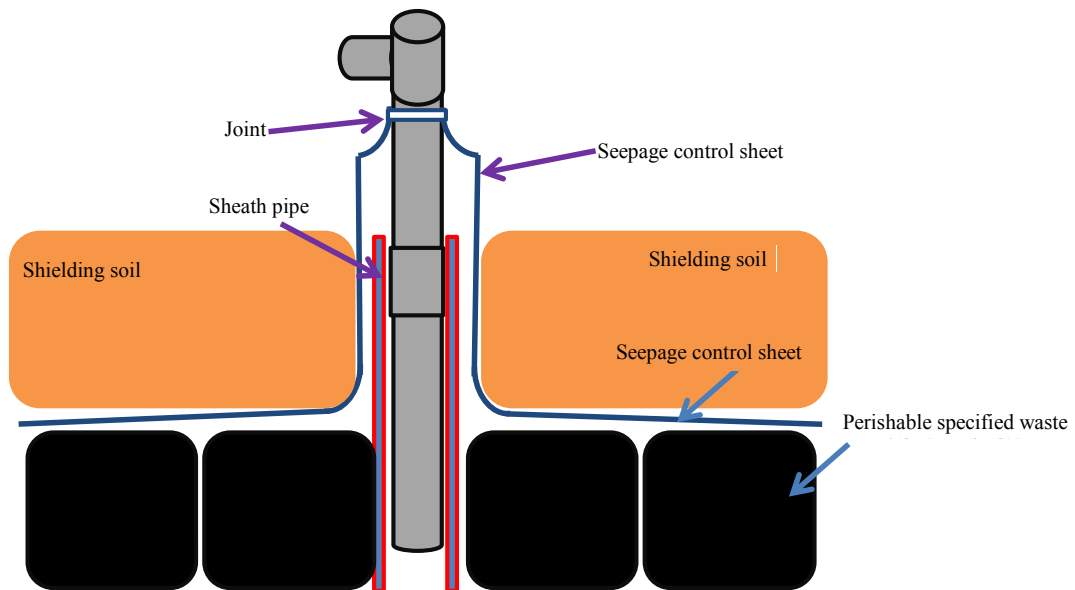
Prevention of infiltration of rainwater into the degassing pipe joint (Example of construction)
